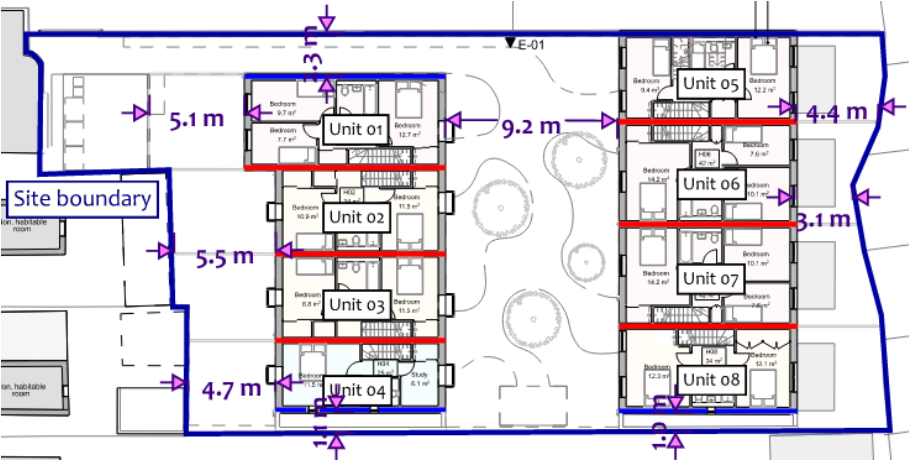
Location and distances to site boundaries at First floor (northeast at page north)
